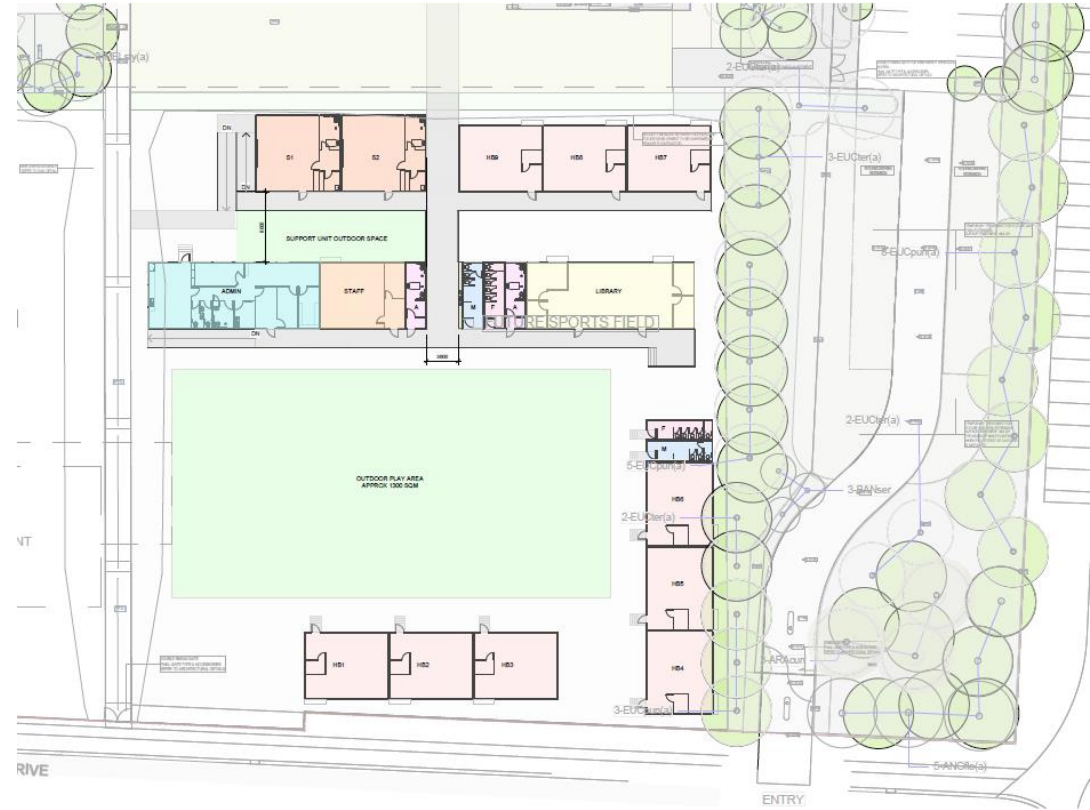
Design Plan for Temporary School Site – New Public School at Mulgoa Rise
